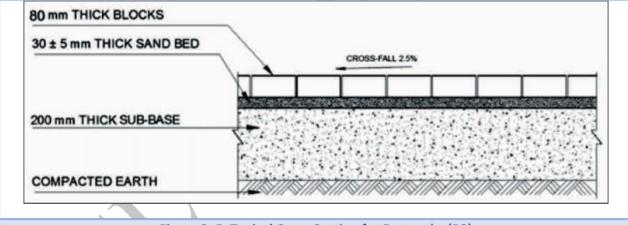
Typical Cross-Section for Footpaths (R3)
